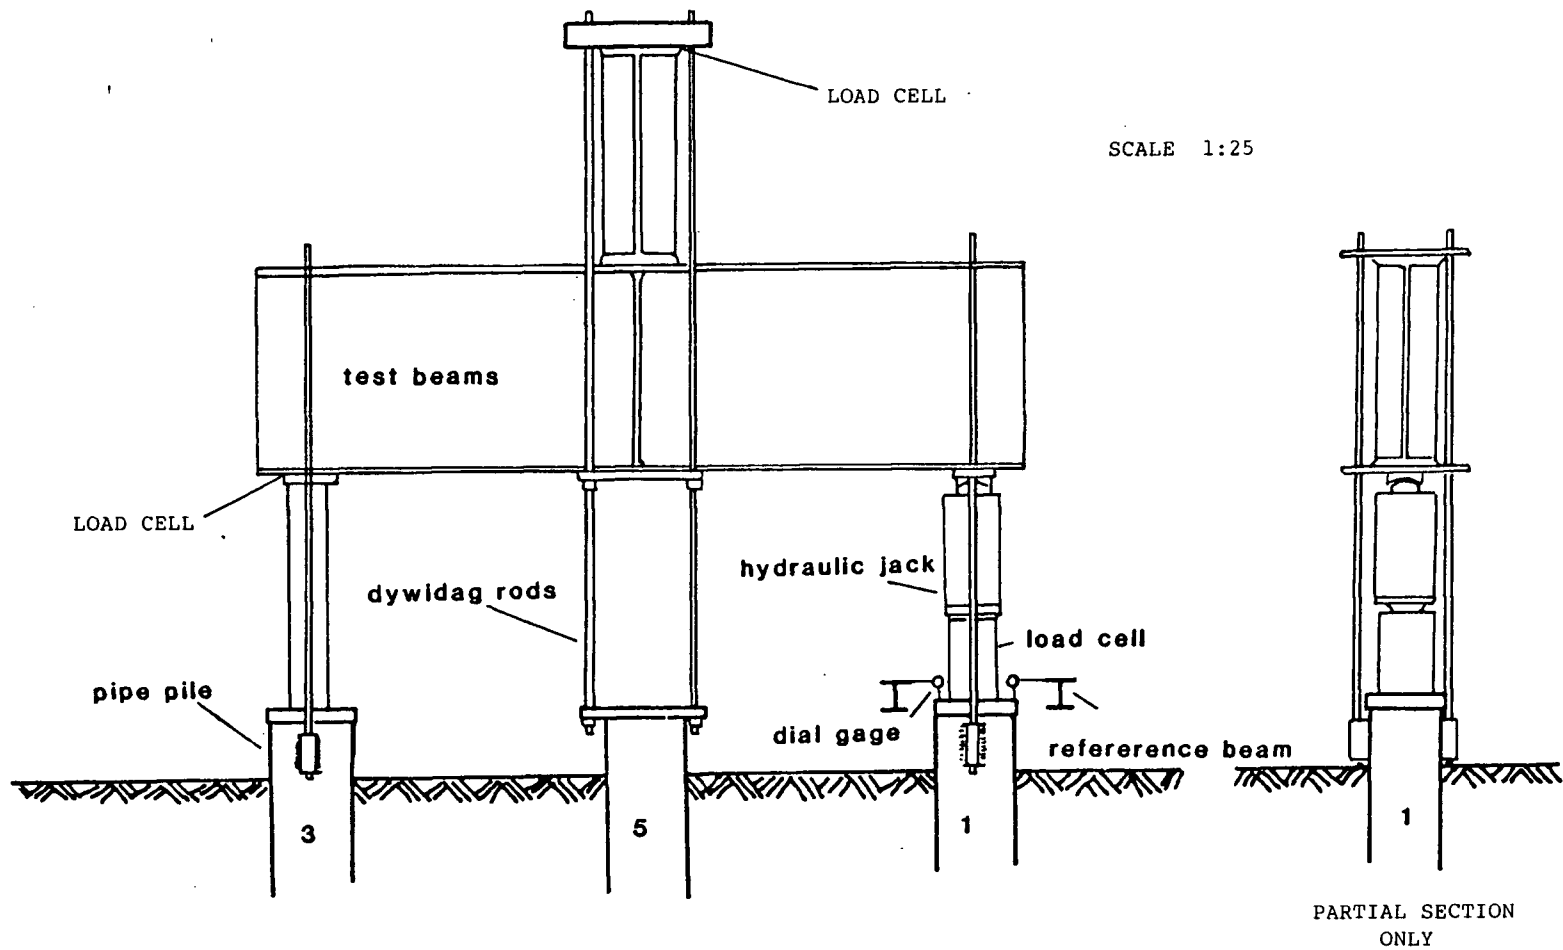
TYPICAL AXIAL PILE LOAD TEST SET UP FOR PILES 1 TO 4
